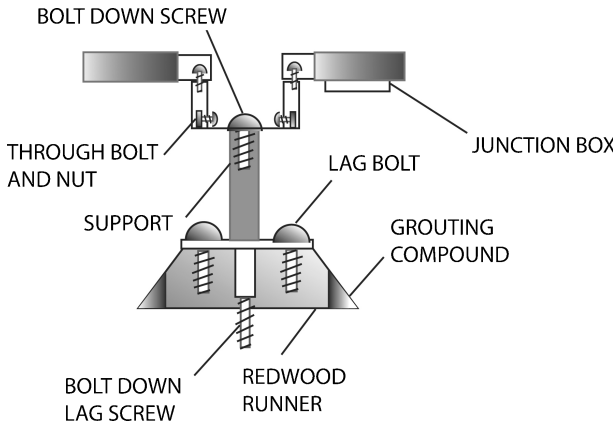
Typical roof mount solar power railing installation penetration detail. *Courtesy of Vector Delta design Group.
